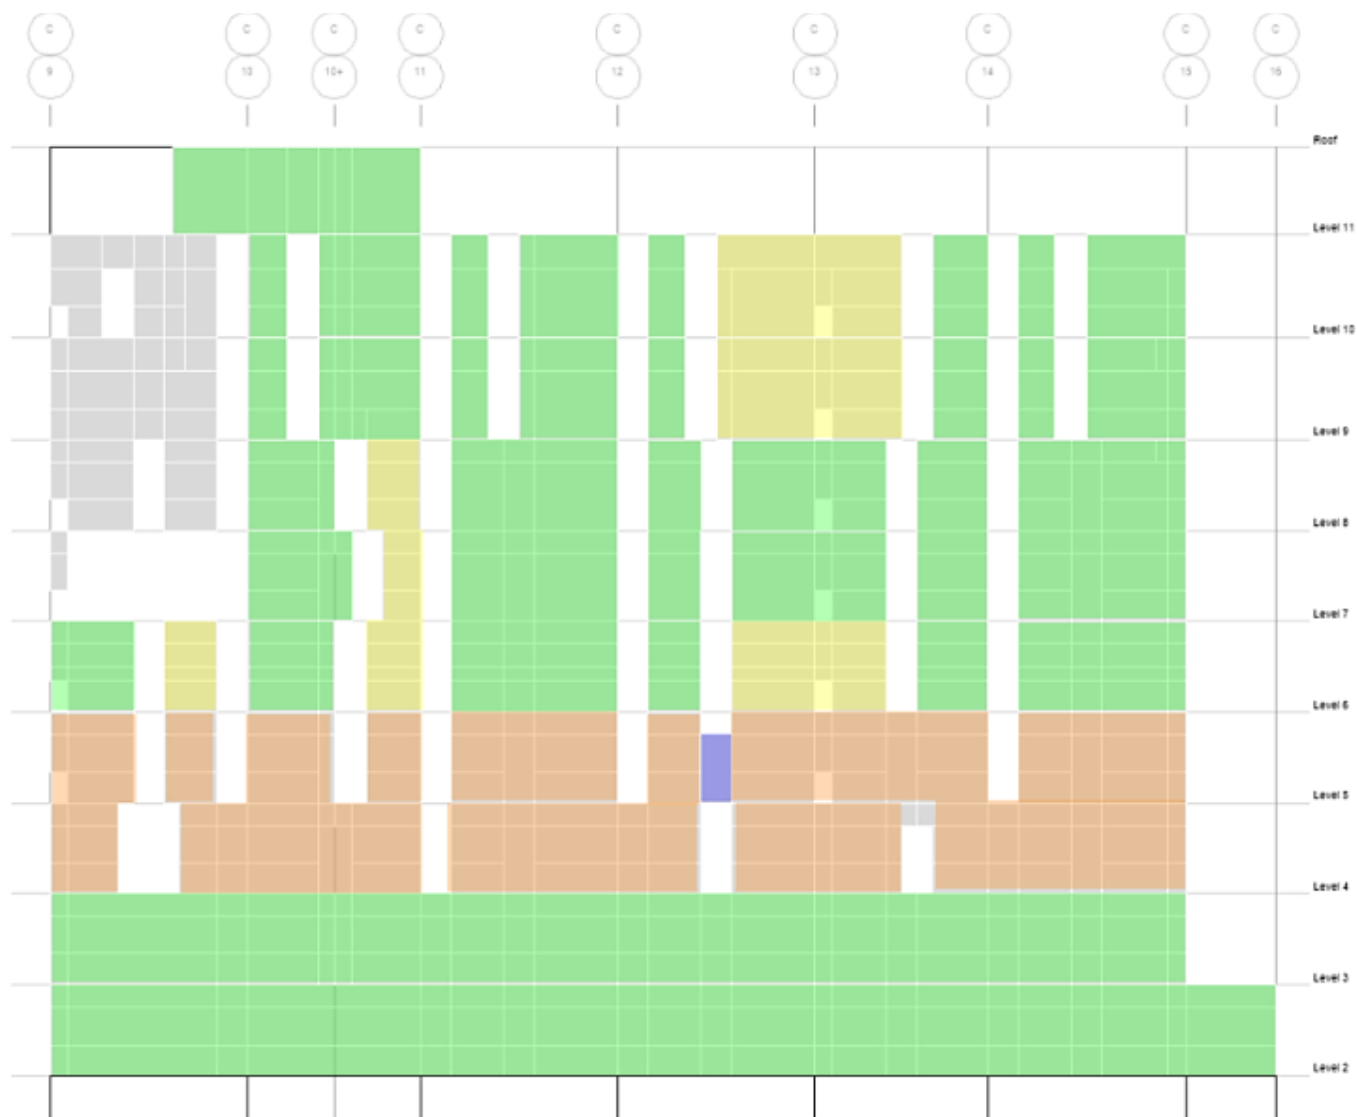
, Gridline C Longitudinal Direction Wall – South Structure
